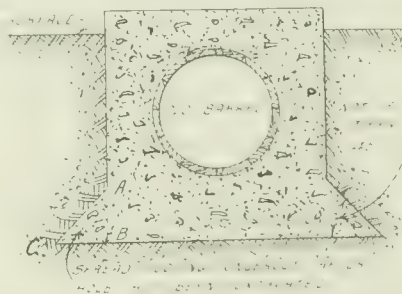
SHOWING HOW TO SAVE CONCRETE WITH OLD BARRELS AND HOW TO UNDER-CUT FOR A SPREAD FOOTING.
